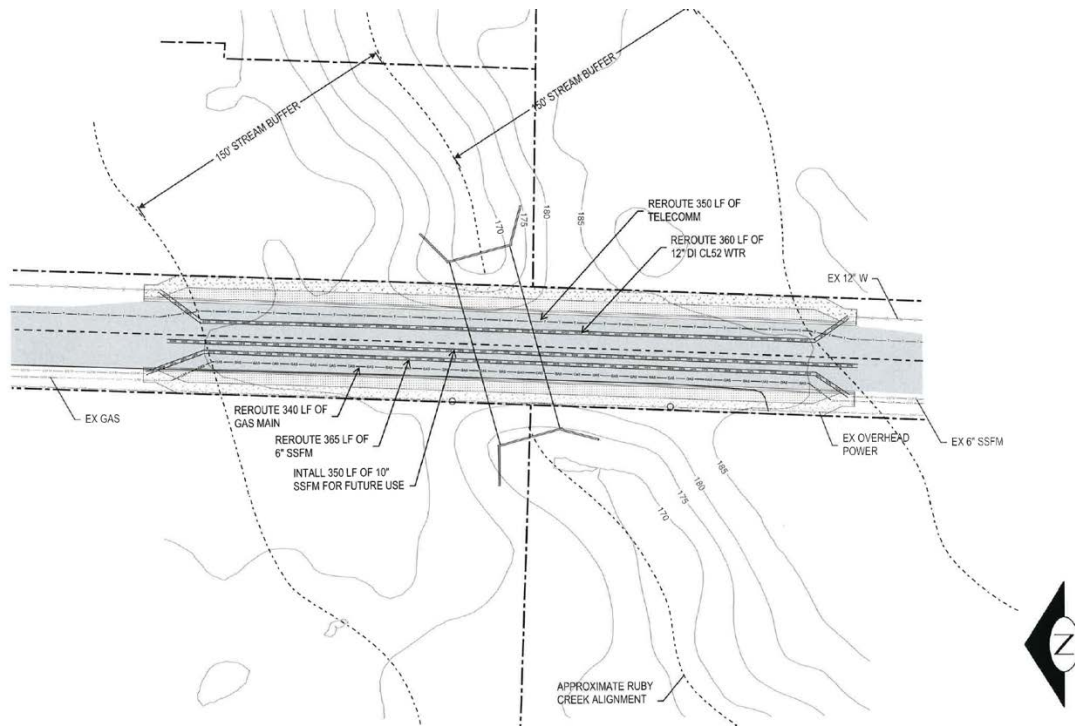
The City has developed preliminary culvert replacement plans for the Ruby Creek culvert under Sidney Road SW and is seeking grant funding for this project.
